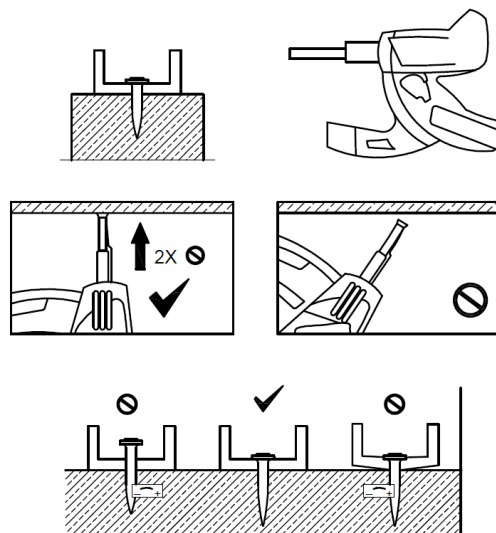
INSTALLATION INSTRUCTIONS FOR POWER ACTUATED NAILS
